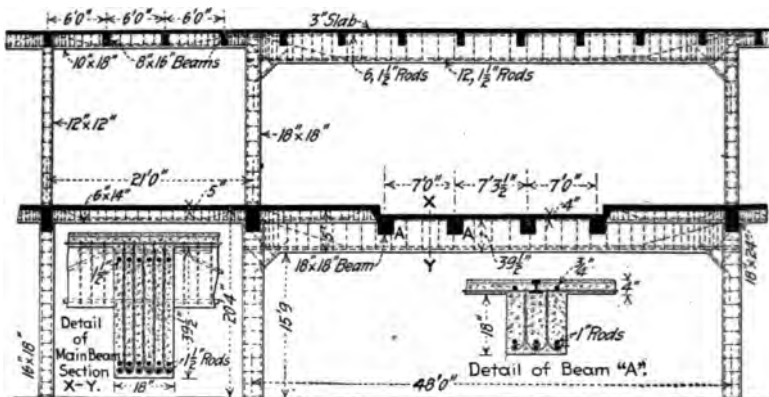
Longitudinal Section, Overhauling Shop, Philadelphia Rapid Transit Co.
